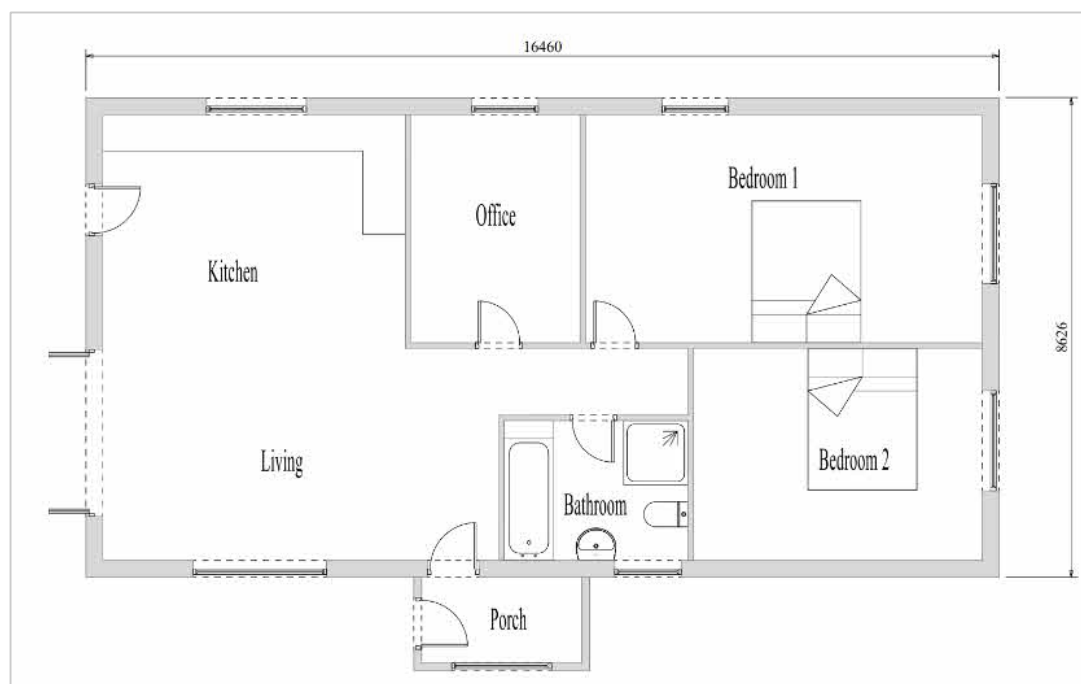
PROPOSED PLANS AND ELEVATIONS (23/3643)
